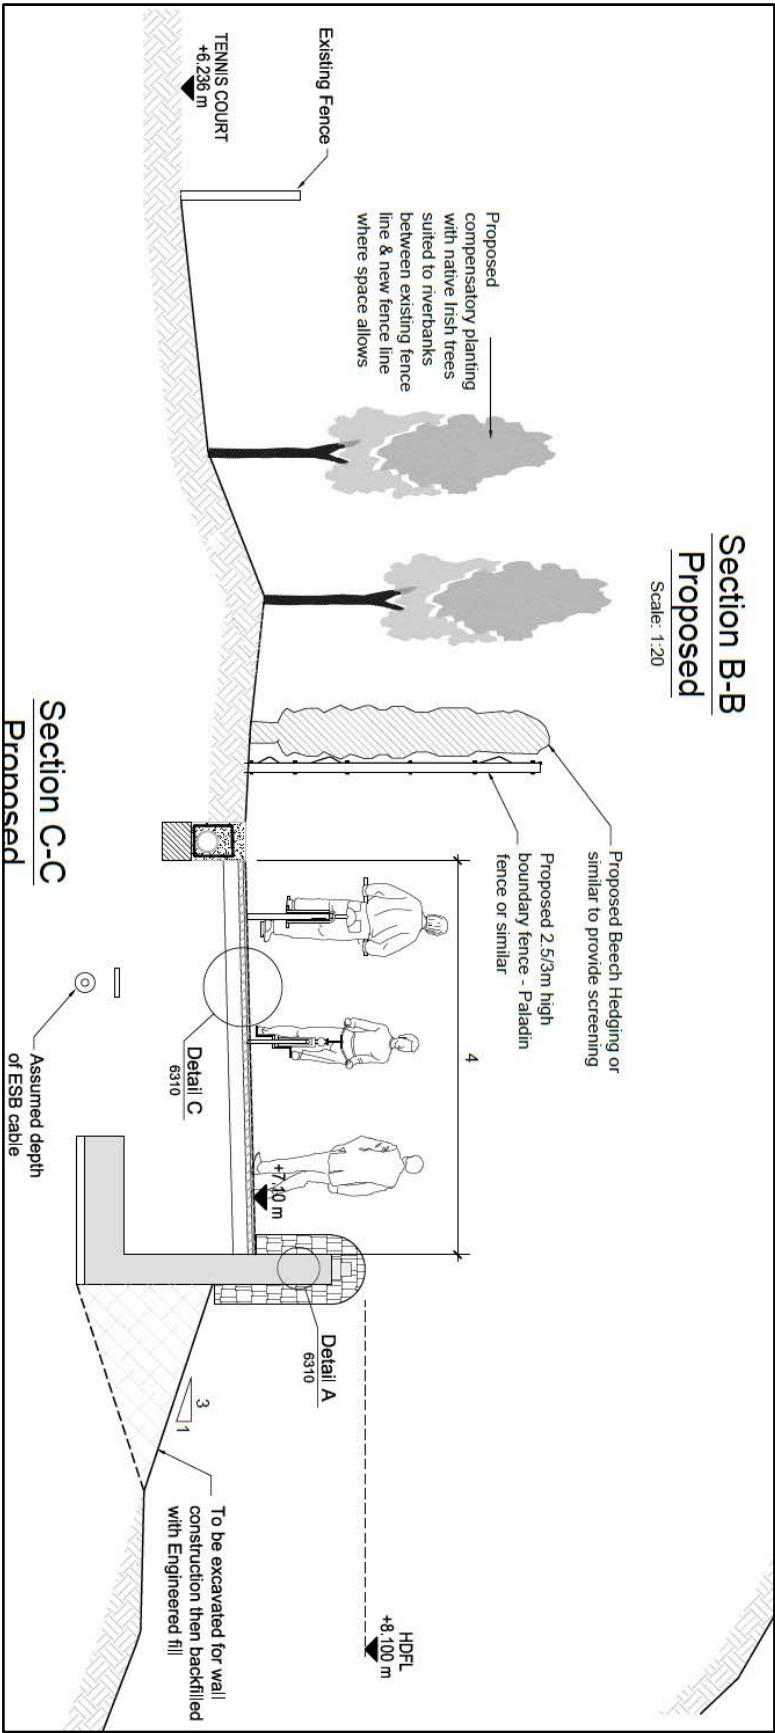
Example of a cross-section of the proposed cycleway amendment showing the proposed flood alleviation works and additional cycleway.
